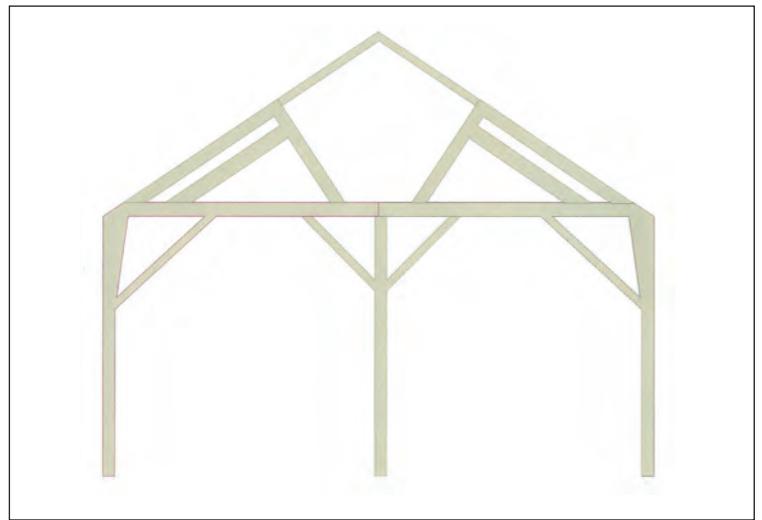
Cross-section of barn rebuilt as house frame on new site.
